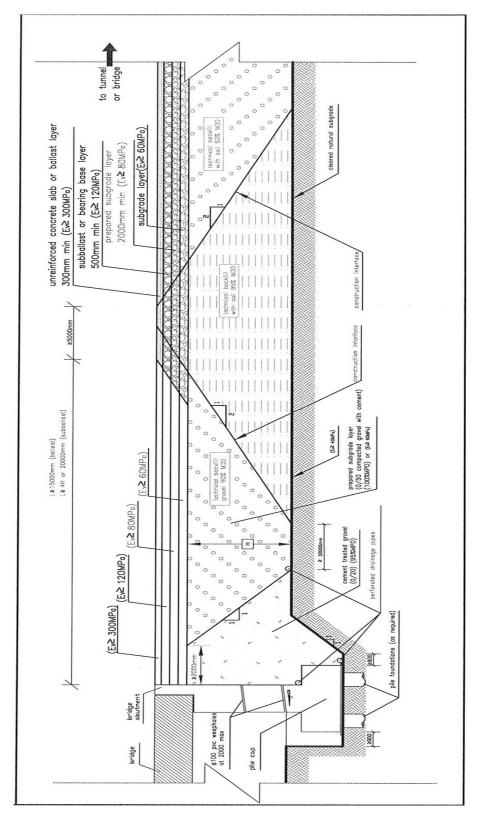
Typical longitudinal fill section of a high-speed train embankment for transi-tion zones between bridge-embankment and embankment-tunnel or bridge
